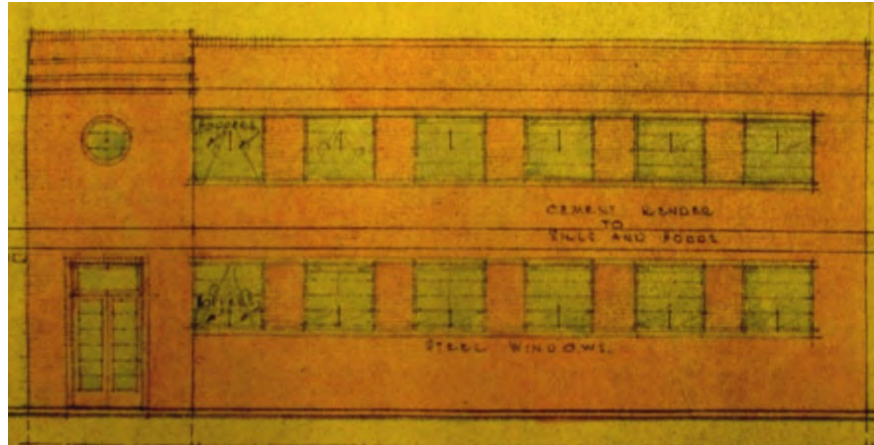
Pelham Street façade to 183-189 Bourne Street as originally designed 1941. Source: Public Records Office Victoria.
